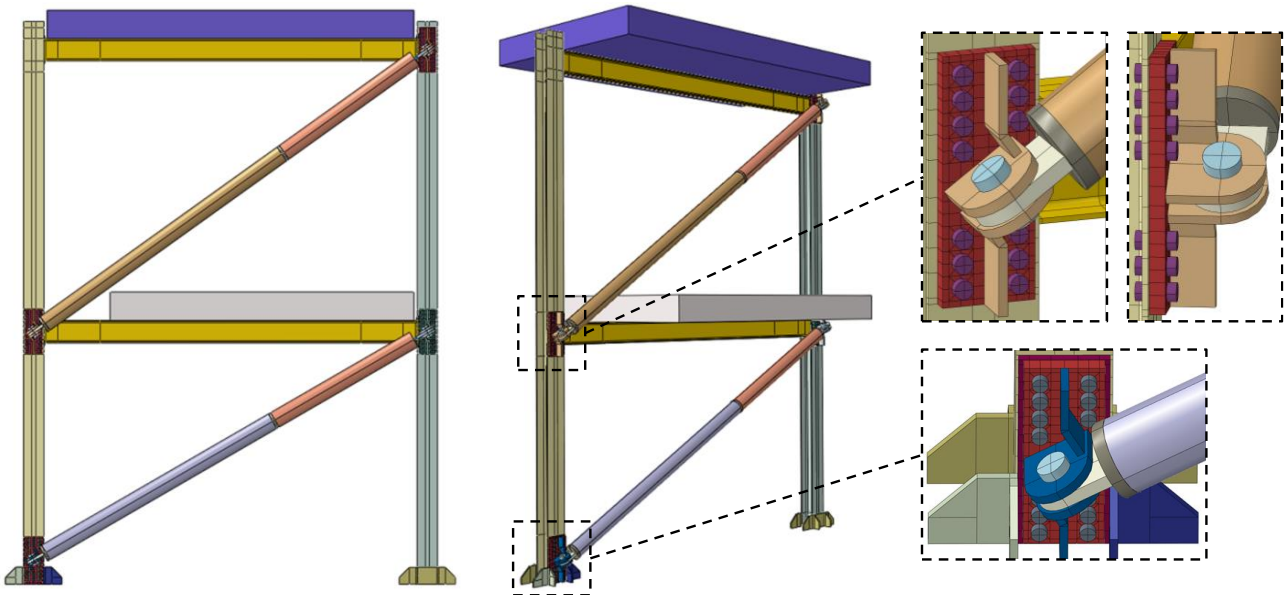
Finite Element (FE) modelling of the steel frame specimen retrofitted in ABAQUS.
